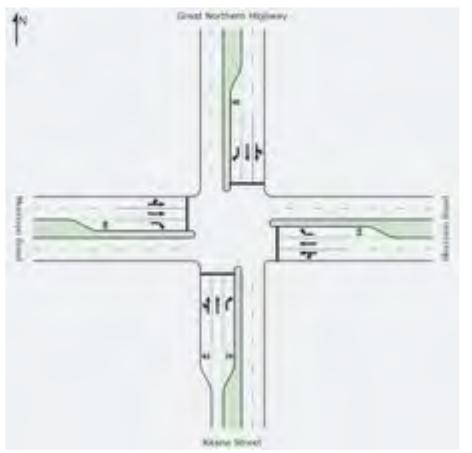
Morrison Road / Keane Street / Great Northern Highway – Existing Geometry
